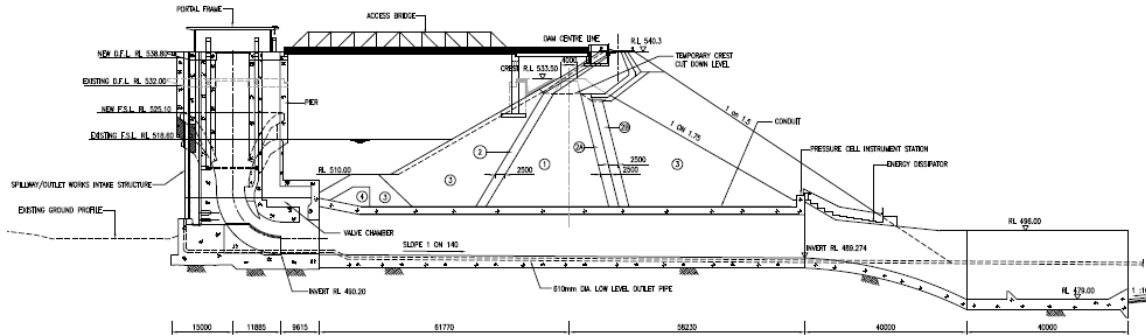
Cross-section showing raising of the embankment, the Morning Glory Spillway and the access bridge.
